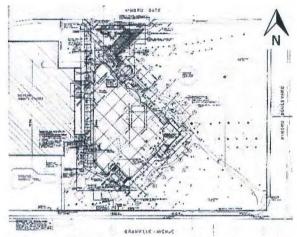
Site Plan (from Howard Yano Architects). Figure 2 – Aerial View (from Google Maps).
